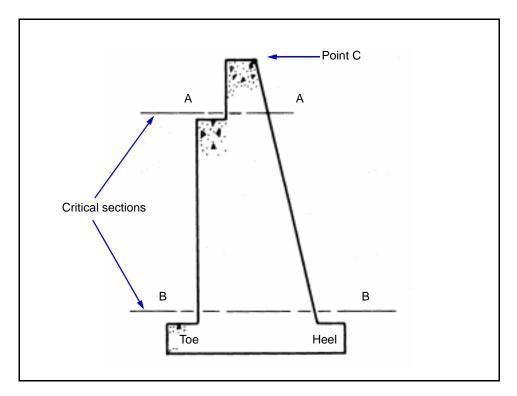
Critical Sections in a Mass-Concrete Abutment
